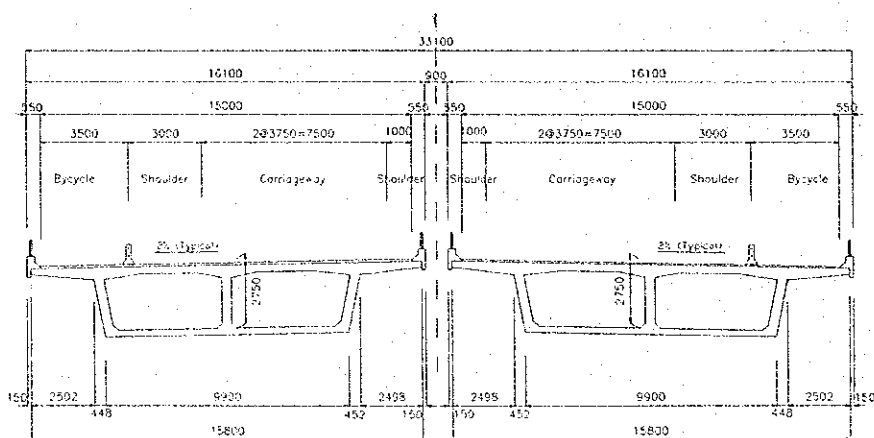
Typical Cross-sections of Superstructure of Approach Bridge 1
